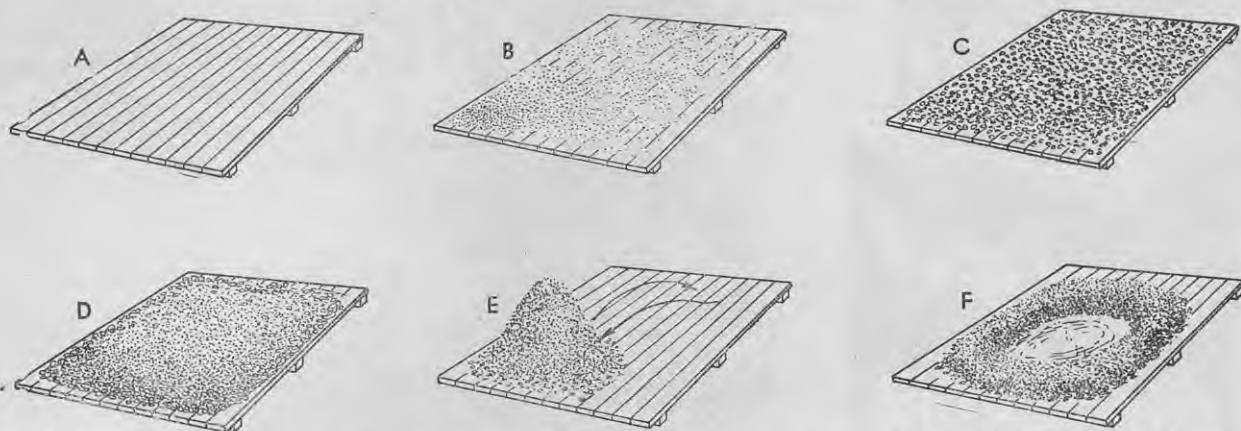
Stages in mixing concrete by hand. A—Flat surface made of timber. A concrete floor or slab can also be used. B—Sand scraped over the surface. C—Coarse aggregate spread over the surface. D—Sand and then cement spread over the aggregate. E—Ingredients stacked in a heap. The heap is worked to the other end of the board and then back to its original position. F—The mixture is spread out and a hollow made in the centre. The water is then added and the mixture mixed from the outside in to the centre.
